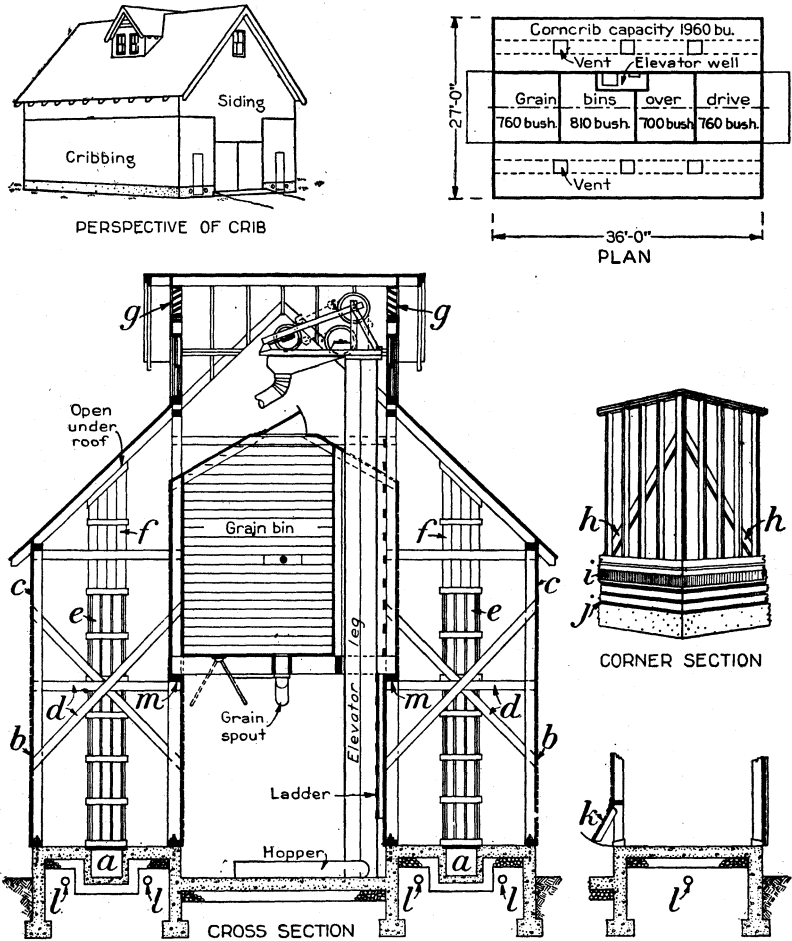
Construction of frame corncrib and granary, design No. 2587; a, Shelling trench; b, bevel-edged cribbing; c, solid sheathing; d, cross bracing; e, slatted ventilators; f, tightly boarded ventilator shaft; g, louvers; h, corner bracing; i, 8-inch metal-band rat proofing; j, ½-inch wire-mesh rat proofing; k, shelling door; l, tile drain; m, wall plate supporting grain bin
